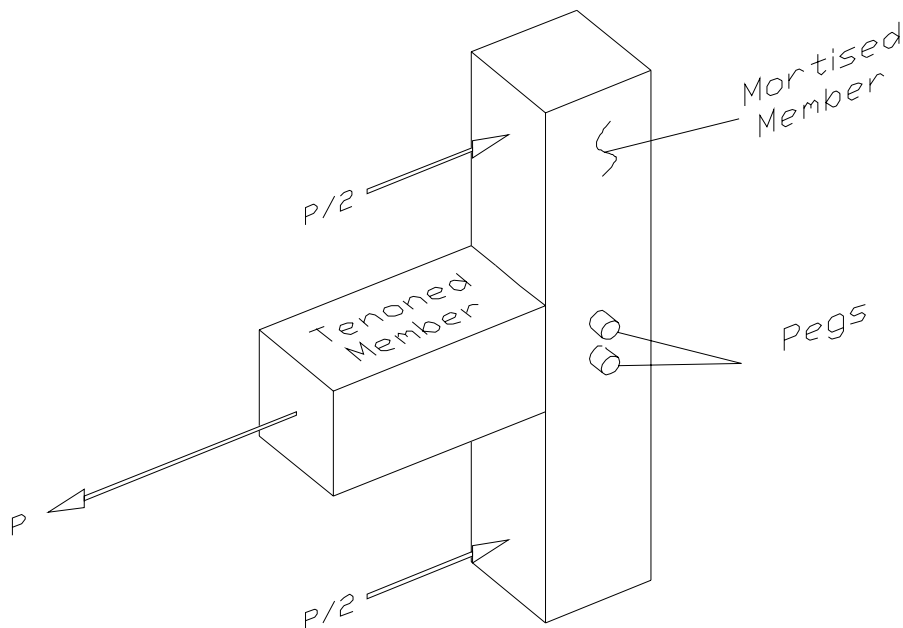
Tension Loading of Mortise and Tenon Joint
